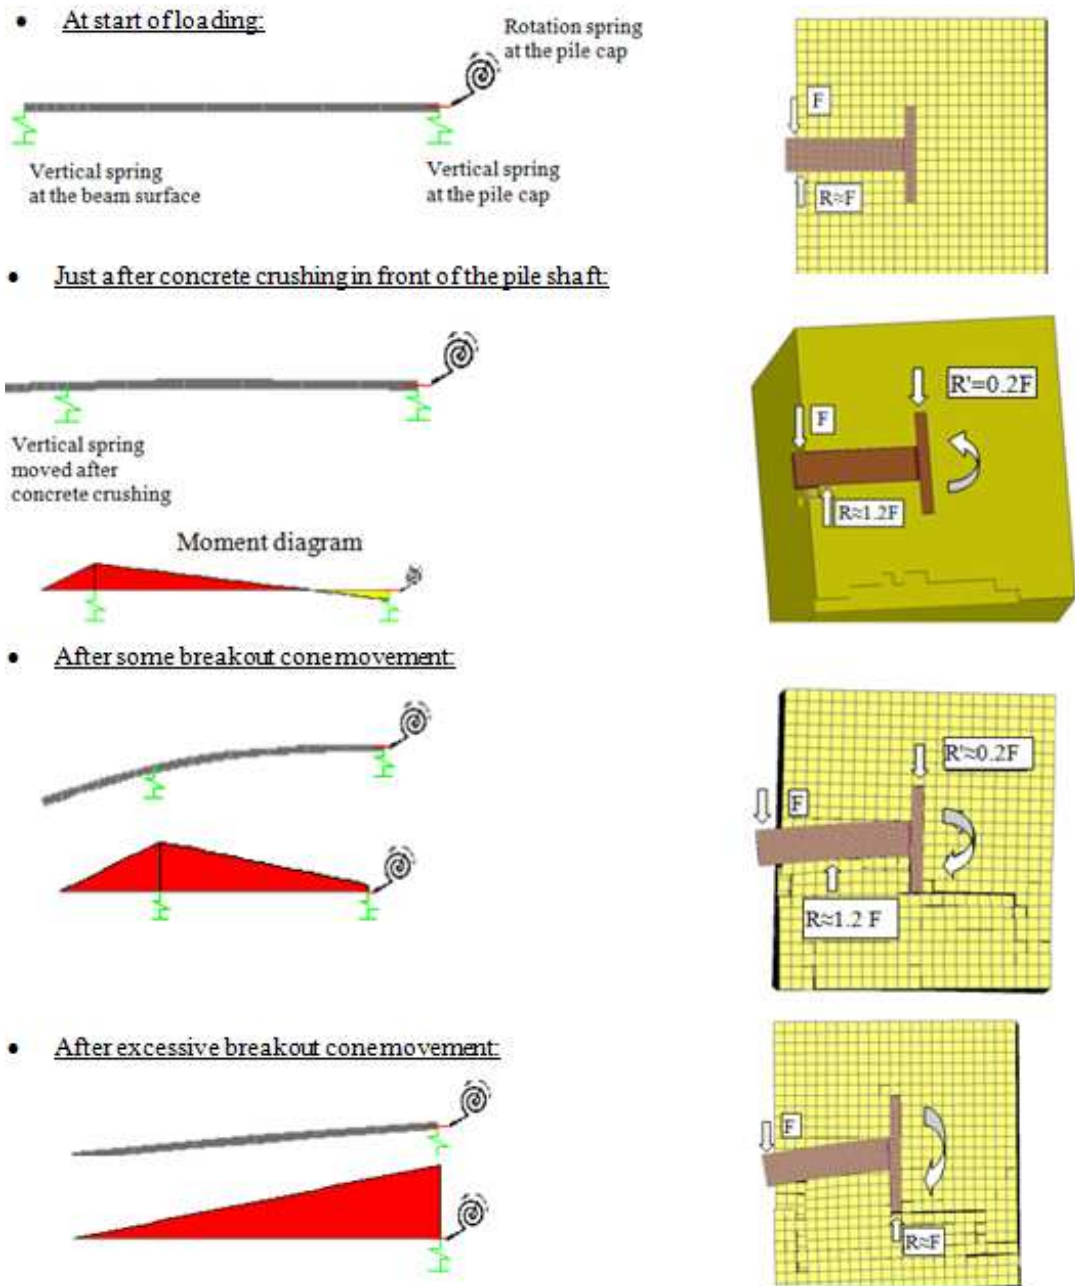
10 Structural behaviour and load transfer mechanisms of the specimen subjected to shear loading
